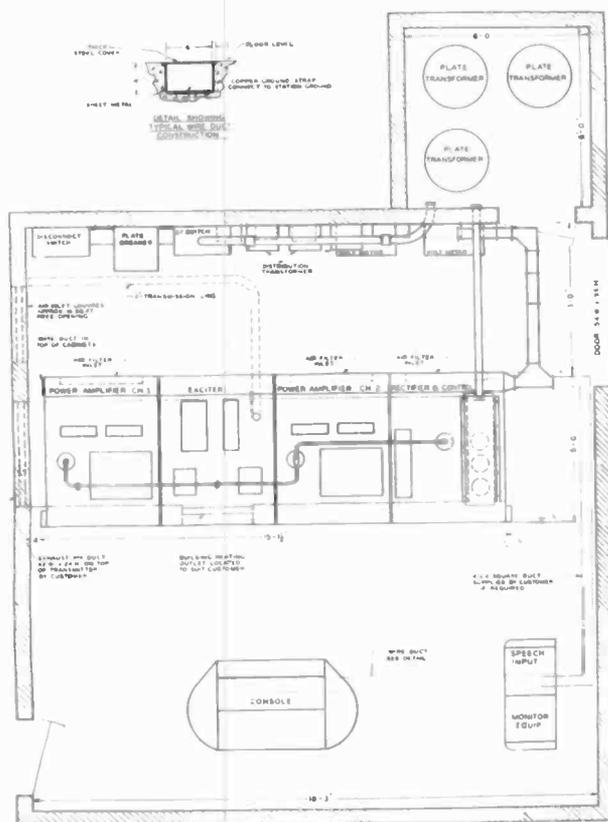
A typical 50-KW AM transmitter floor plan installation, wiring basic wiring details.
